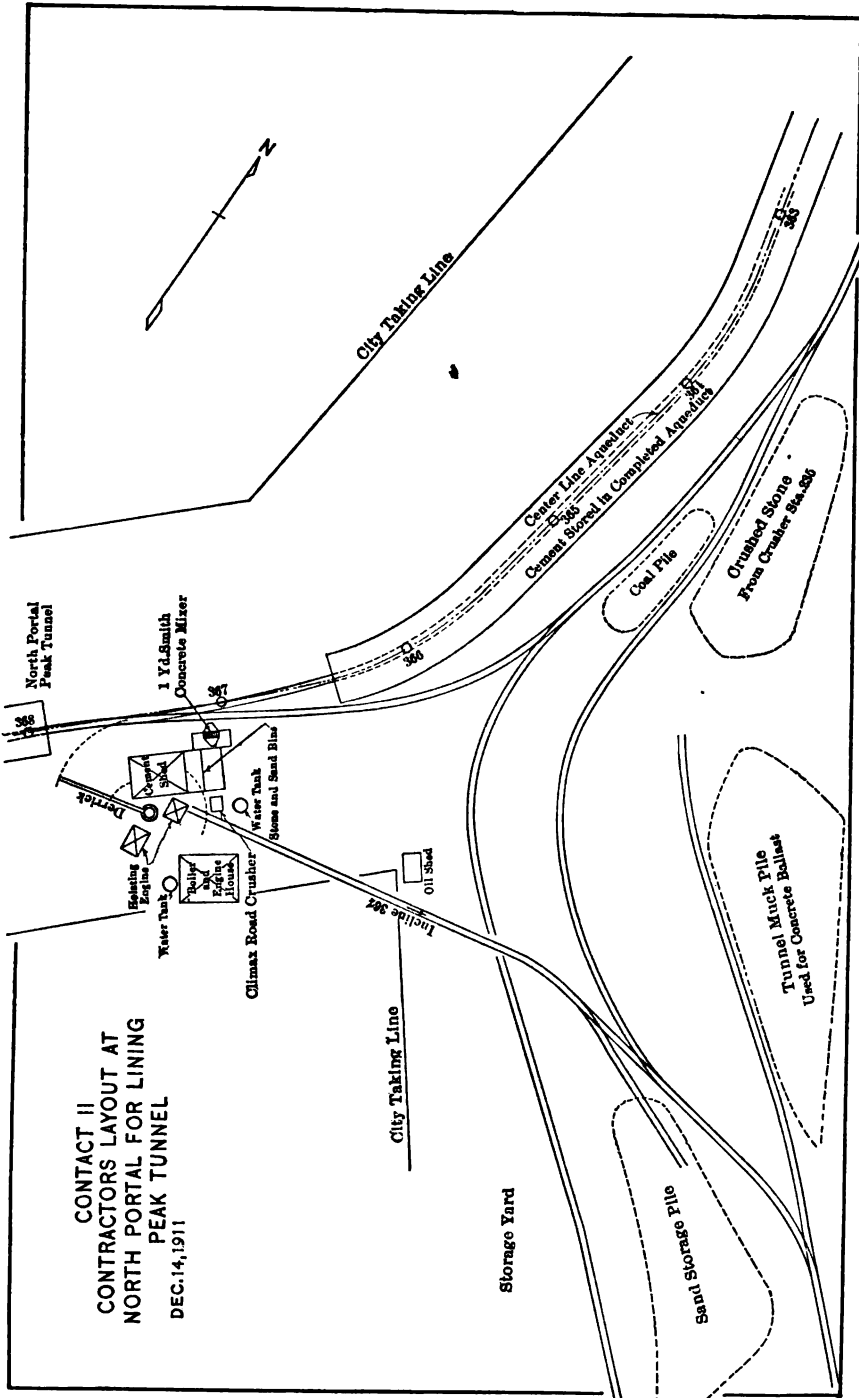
Contract 11. Diagrammatic Layout of Concrete Plant at North Portal of Peak Tunnel.
